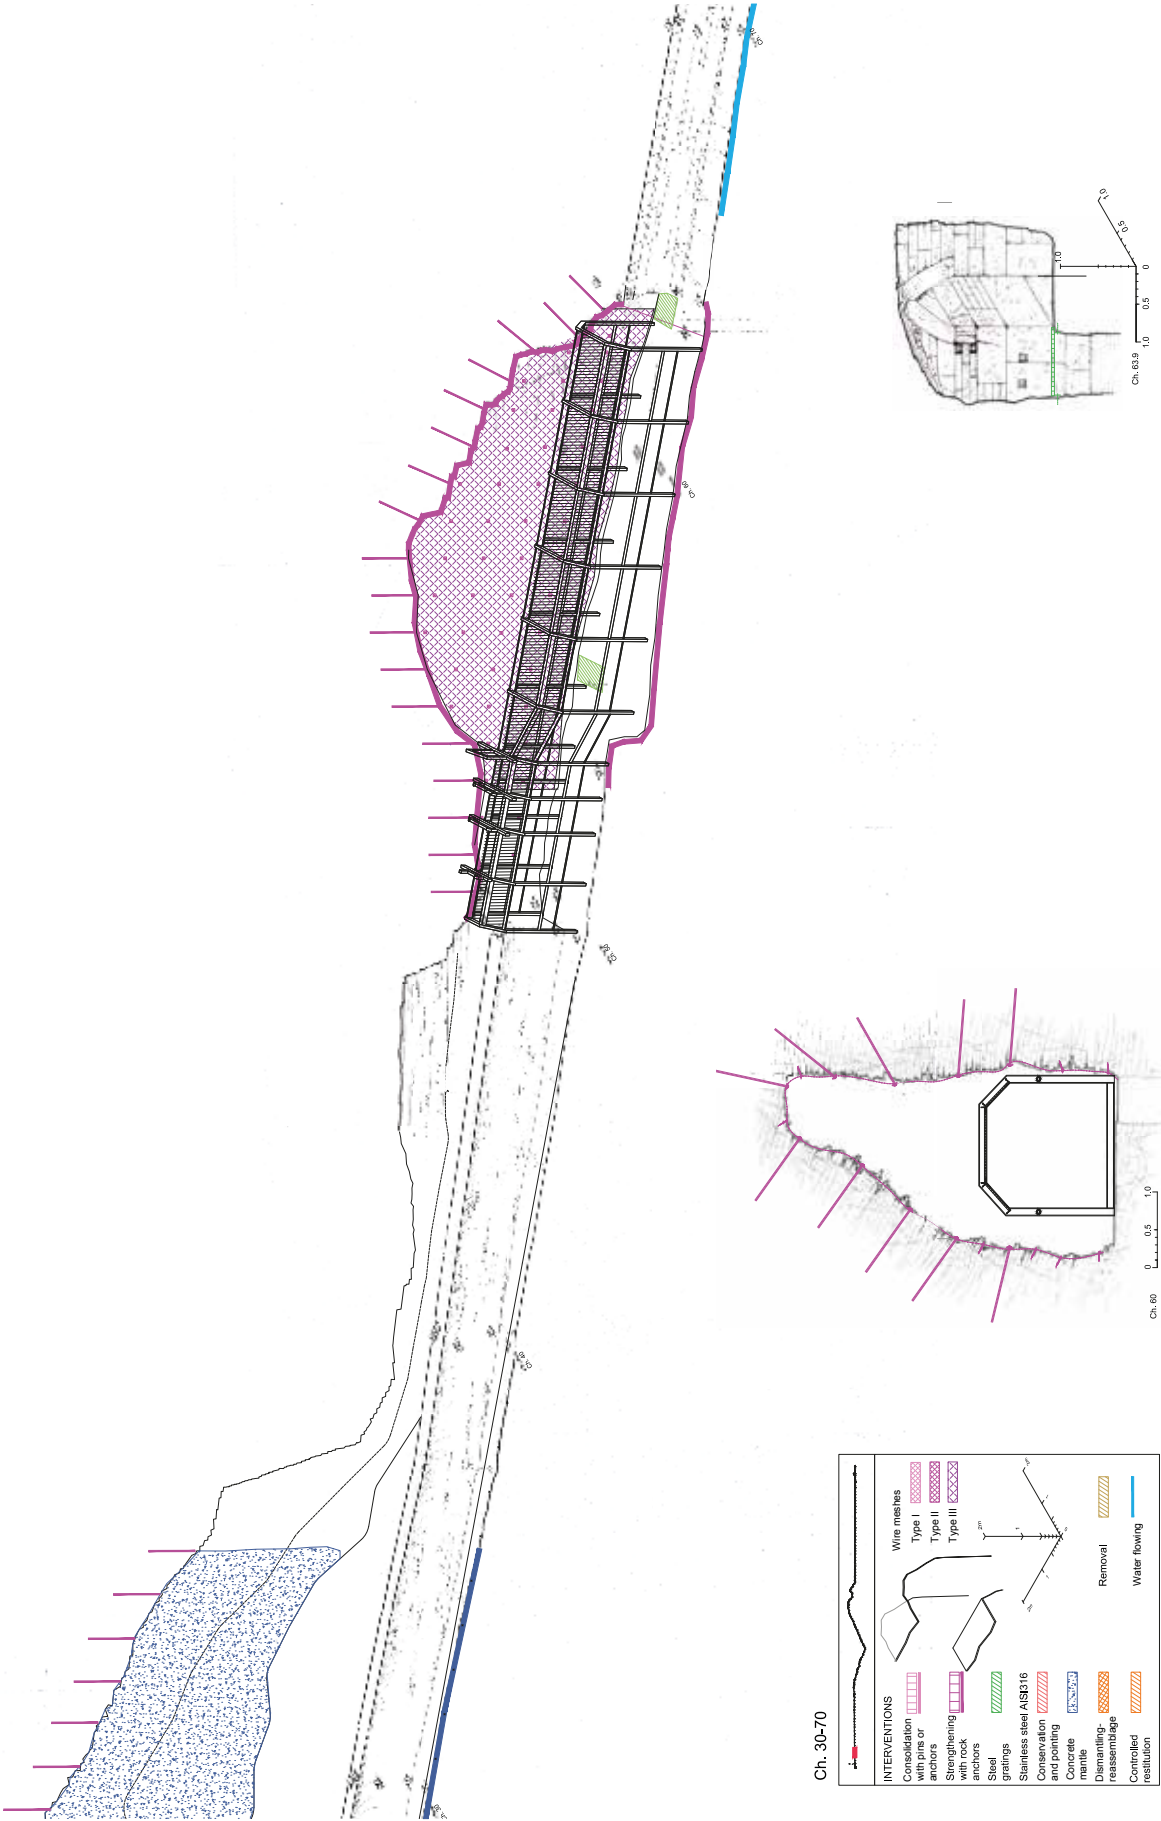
Isometric plan of the tunnel of Eupalinos (scale 1 : 200) with sections (scale 1 : 100), Ch. 30-70
